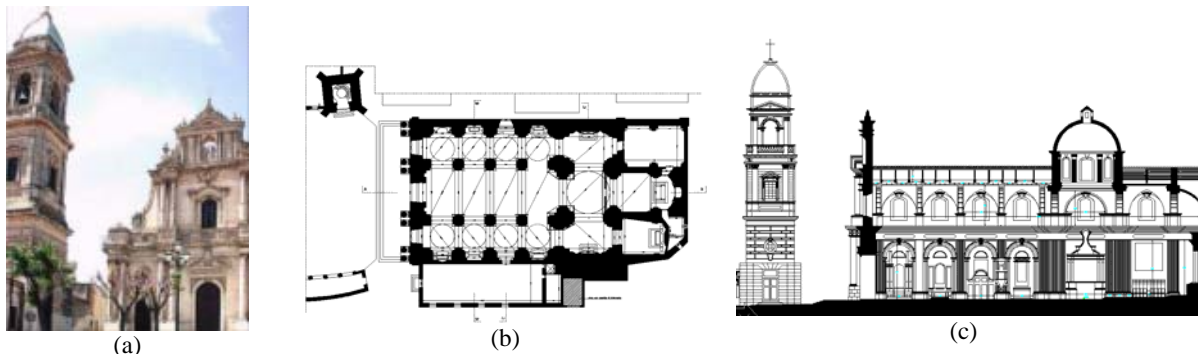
Geometry: (a) photo; (b) plan; (c) longitudinal section
